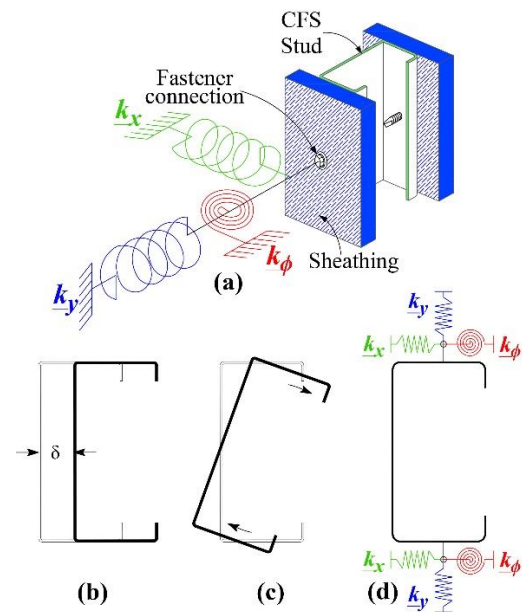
Cold-Formed Steel Sheathed Structural Members - (a) Stiffness components at each Sheathing fastener connections; (b) Failure mode (Cross sectional view) - Weak axis buckling when subjected to axial compression; (c) Failure mode (Cross sectional view) - Lateral torsional buckling when subjected to flexure; (d) Incorporating sheathing stiffnesses in the elastic buckling analysis
